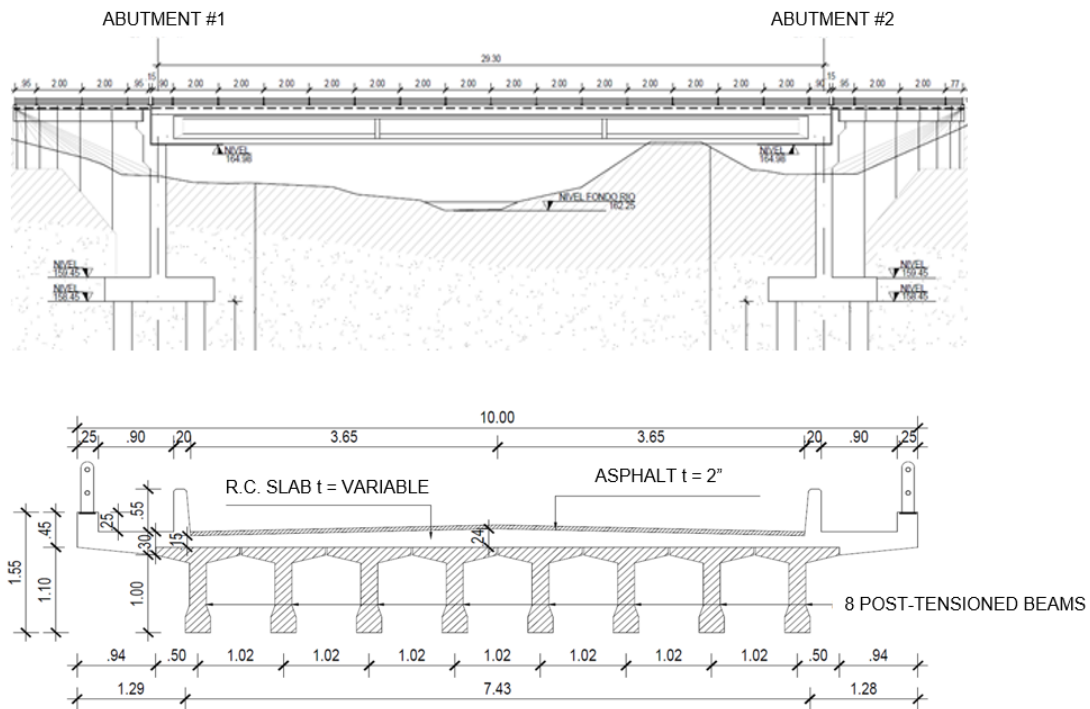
El Cacique Bridge schematic drawings showing the main structure and precast girders
